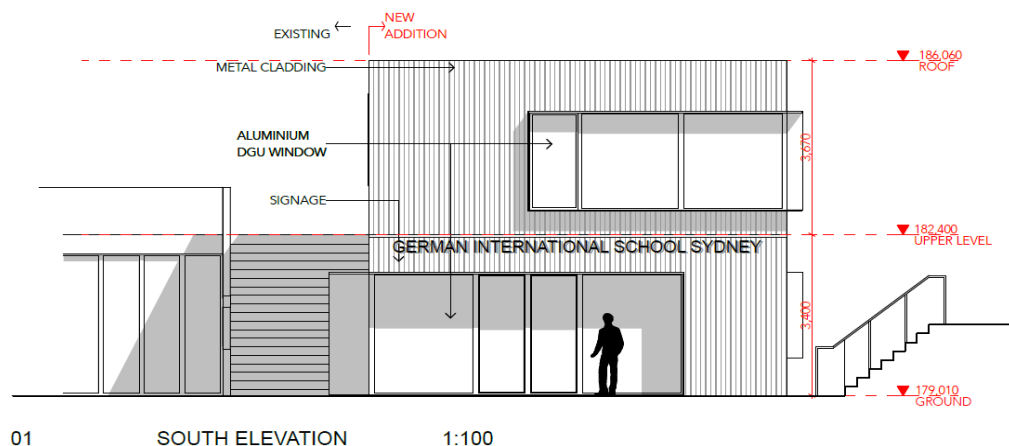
Proposed signage on the south elevation of the proposed administration building extension (Source: Betti&knut architecture)
